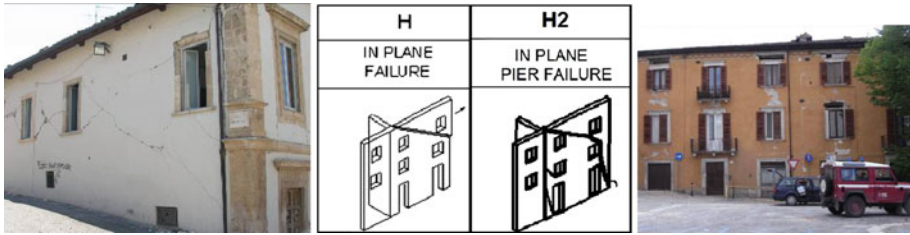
In-plane damage mechanism in pier, H (left), and combined in piers and spandrels, H2 (right)
